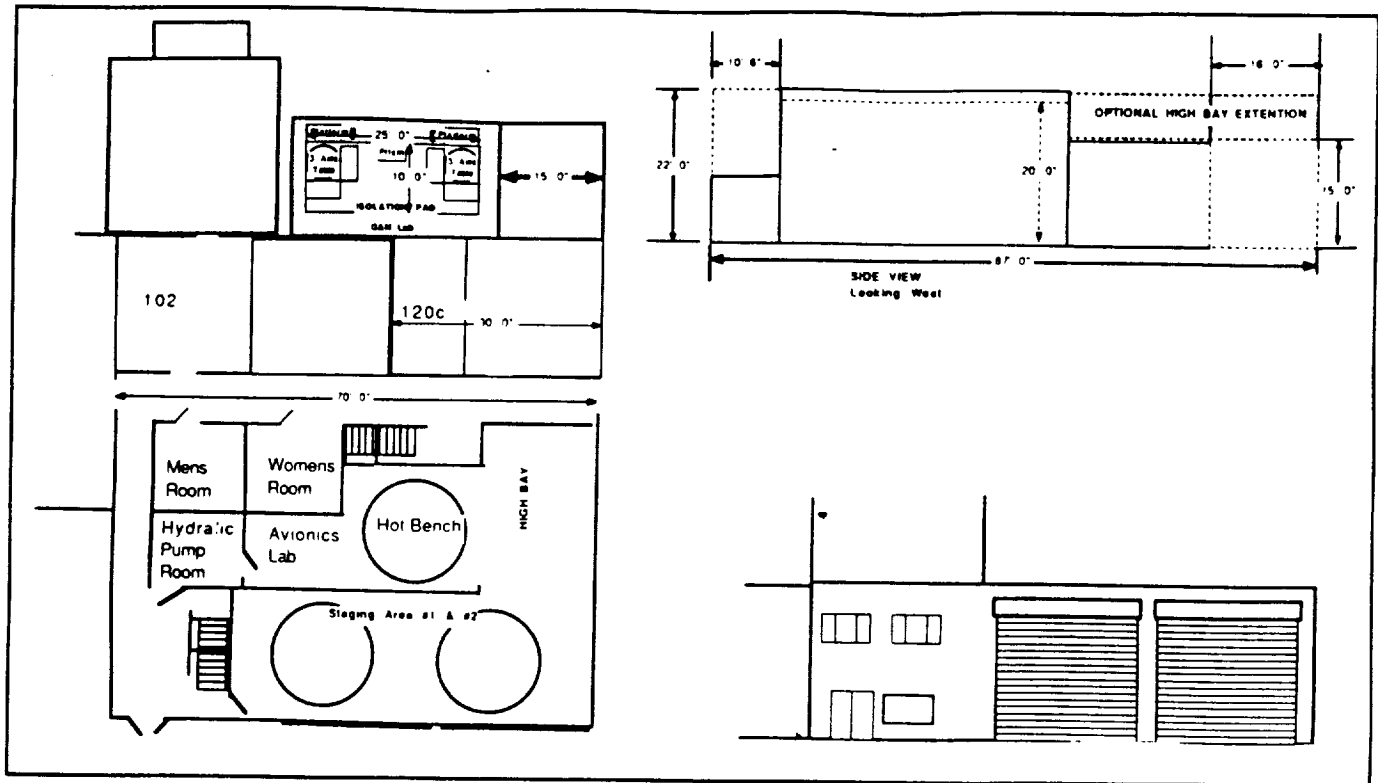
BUILDING 4476 PROPOSED 1ST FLOOR PLAN
